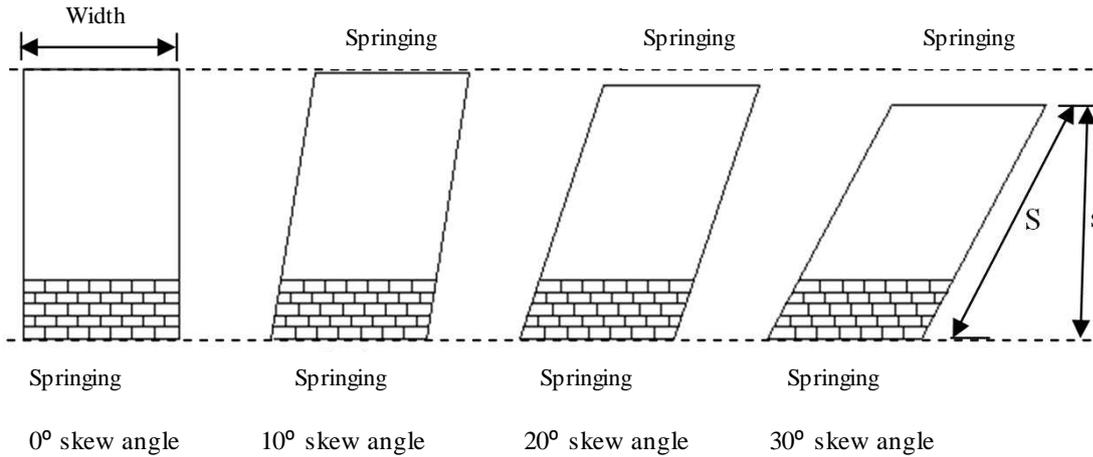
Geometry of the arches studied: Plan view of a typical arch.
